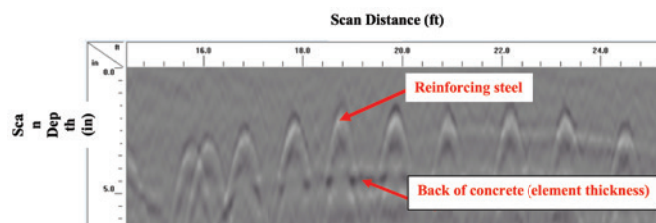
Example display of GPR line scan indicating reinforcing steel and back of concrete location.
